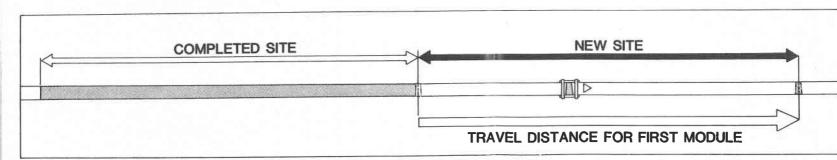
Advancing Z.O.R.O. to a New Construction Site
